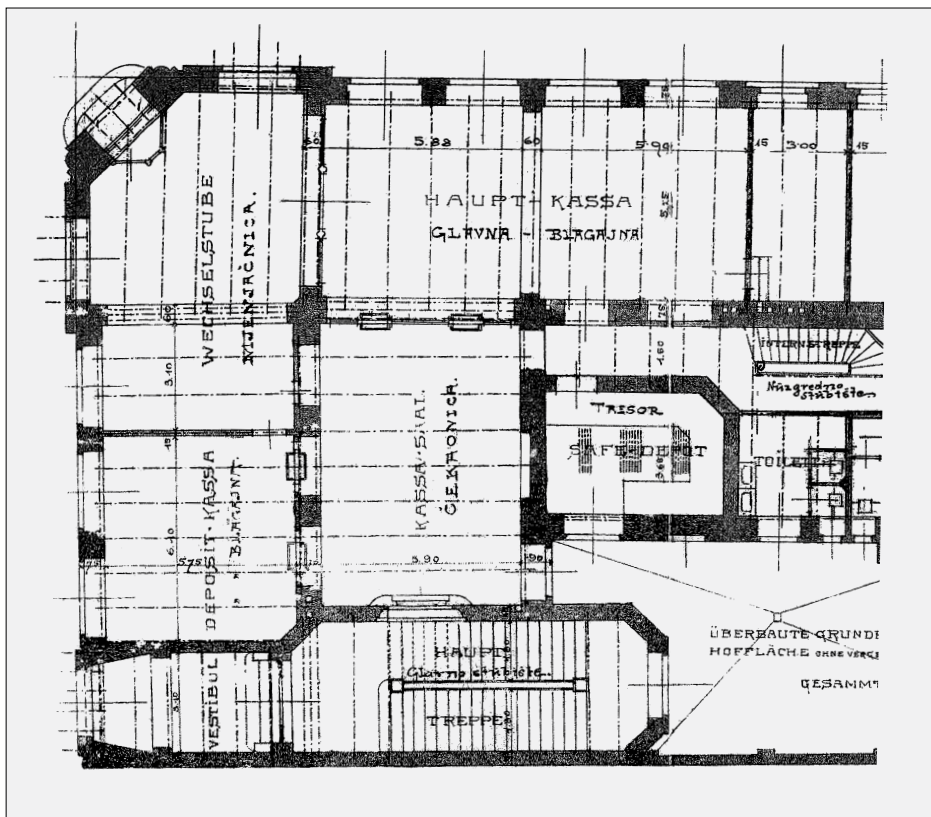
THE PLAN OF THE CASHIER'S HALL
